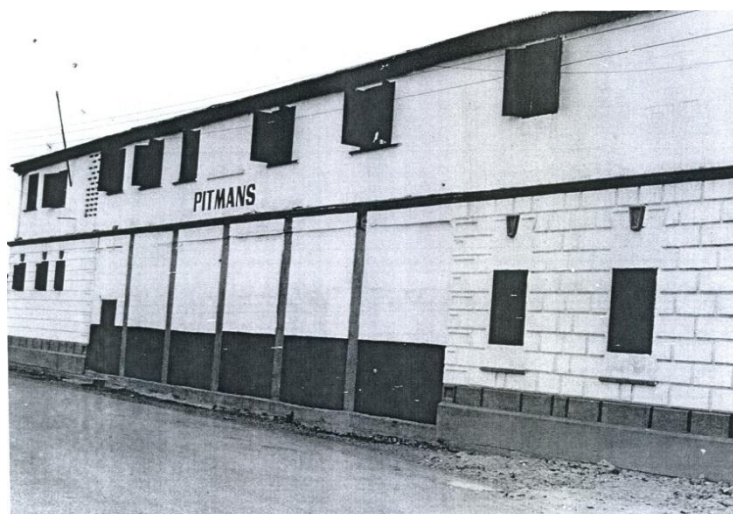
View of Northern facade of the old court building subsequent to renovation works undertaken by Pitman's College (*Source: Courtesy Principal of Pitman's College*)
